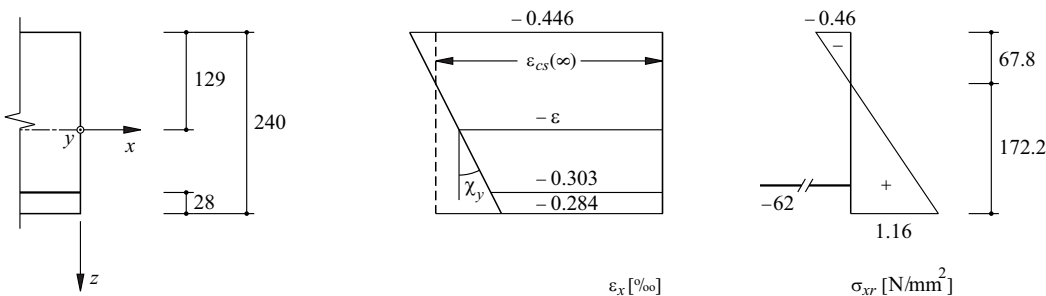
How concrete shrinkage affects a reinforced concrete slab reinforced on one face only
